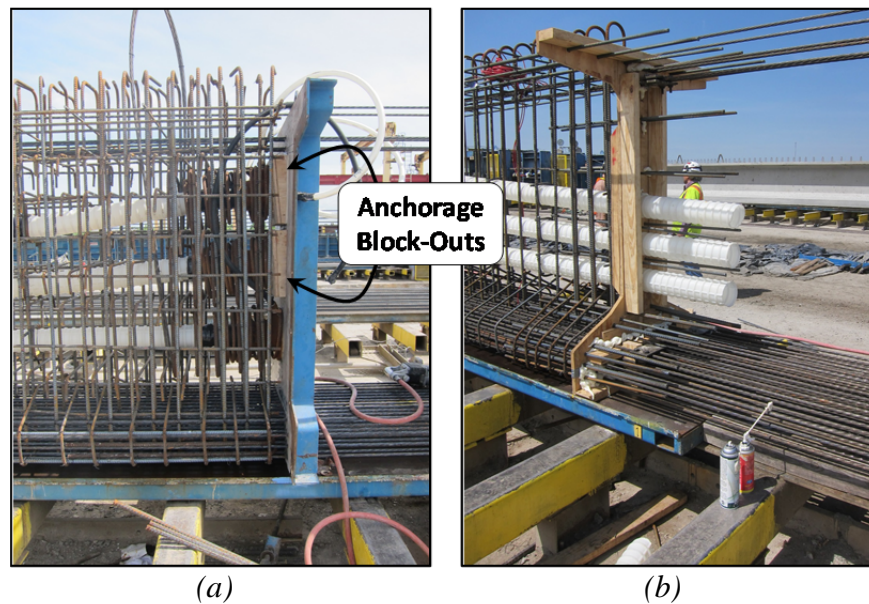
Ends forms of precast girder segments – (a) at thickened end block; (b) at end to be spliced
